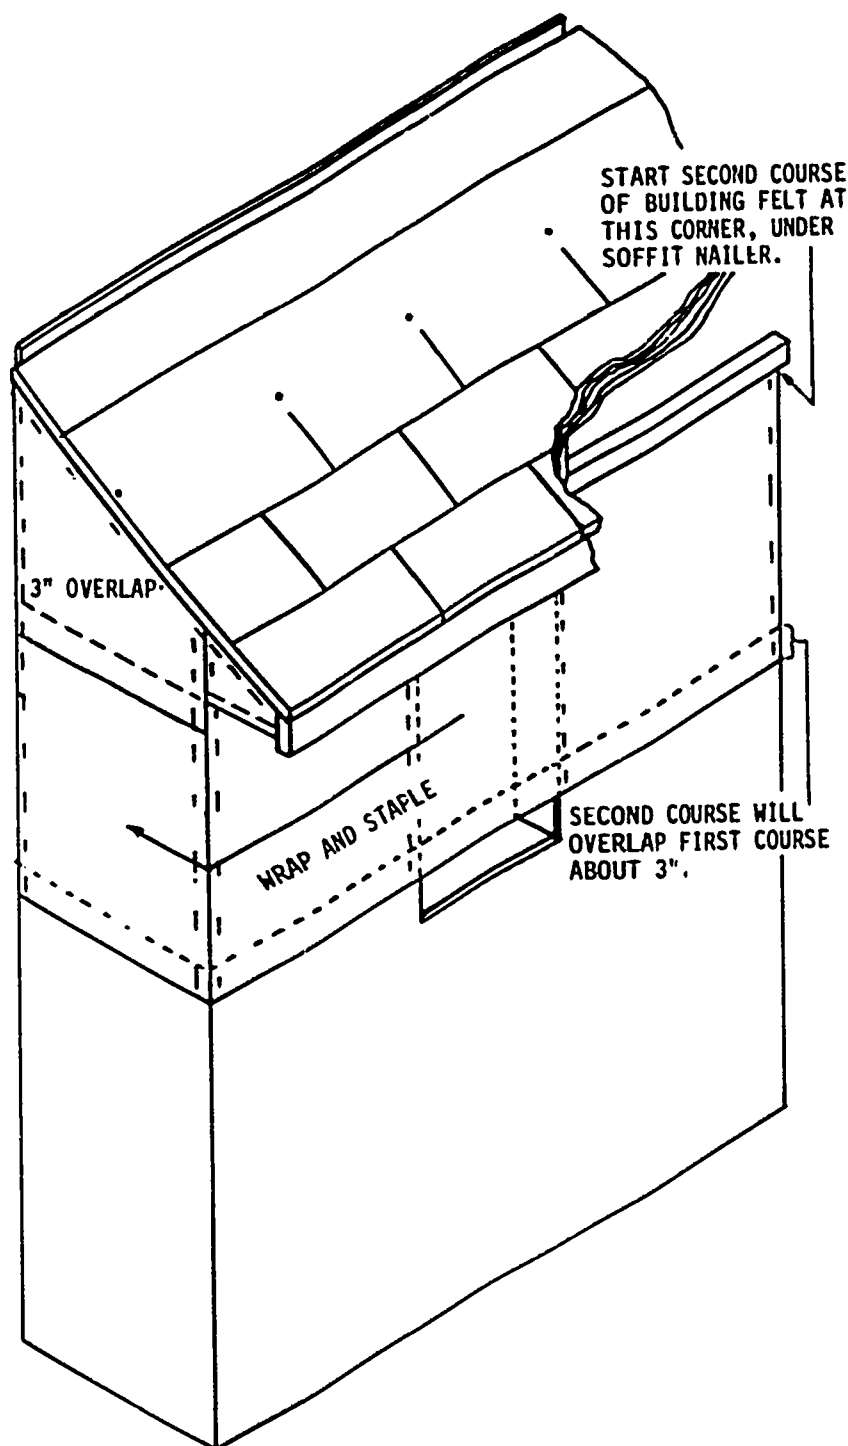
A-3. Applying 18" Strip of Building Felt (Roof structure is cut away to show detail.)
